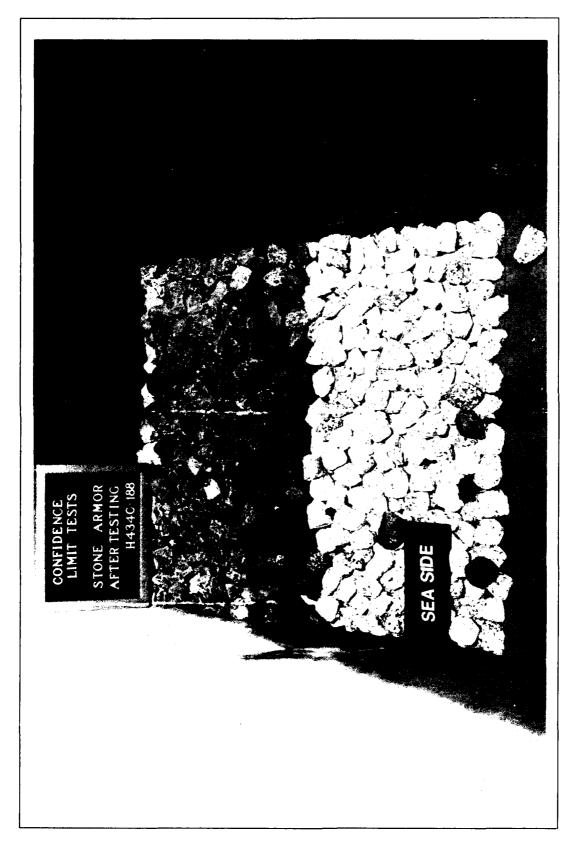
Seaside view of Structure 2 after completion of a typical repeat test
